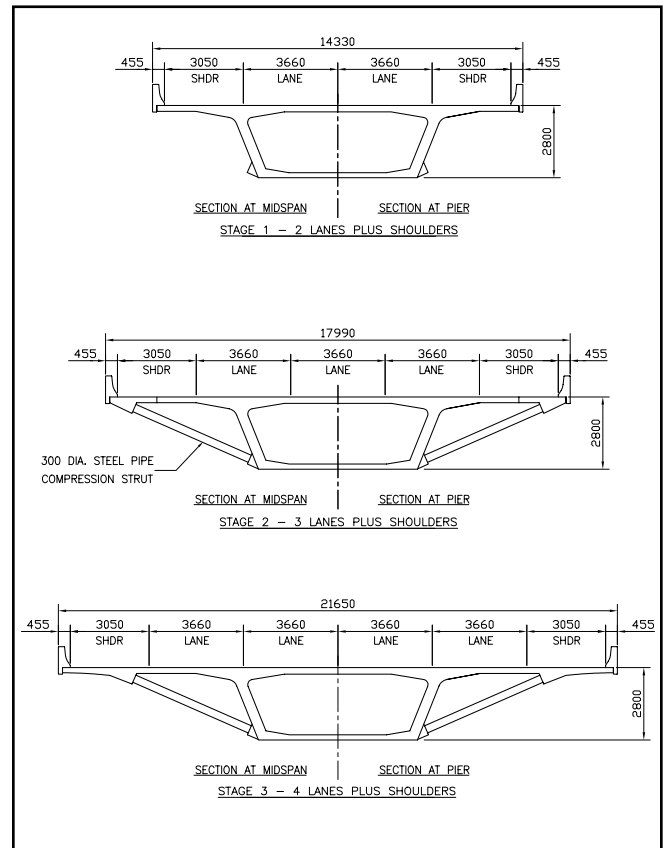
Cross section widening for span-by-span precast segmental bridge.
